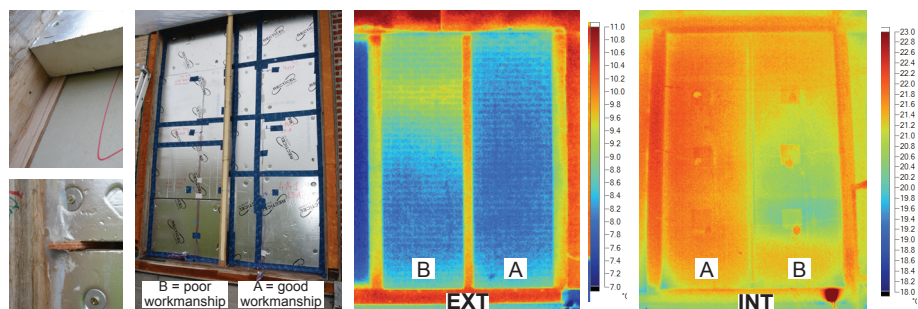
Left: Picture of both test walls with good and poor workmanship before the brick façade was built. Right: Infrared pictures of the exterior (EXT) and interior (INT) faces of the cavity walls with both good and poor workmanship that have been built in the VLIET test building.
